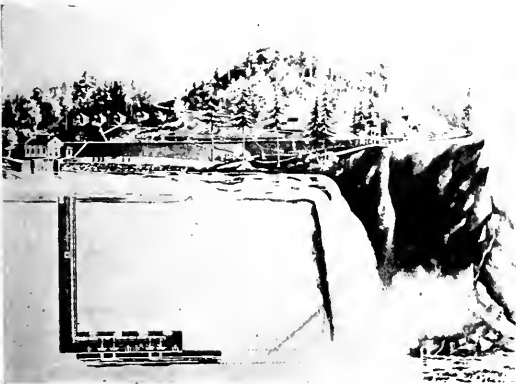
SECTIONAL DRAWING OF HEAD WORKS.
